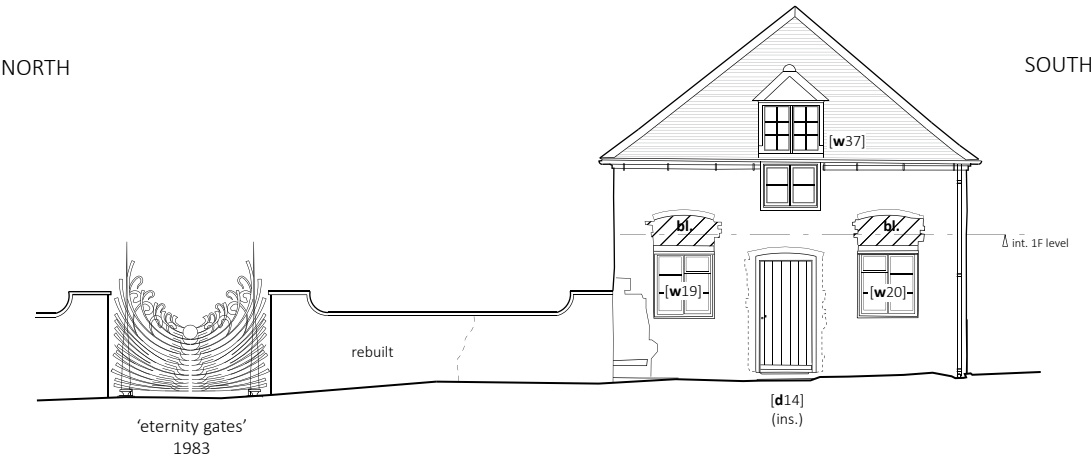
Garden Cottage Range; north elevation (to stable yard)
